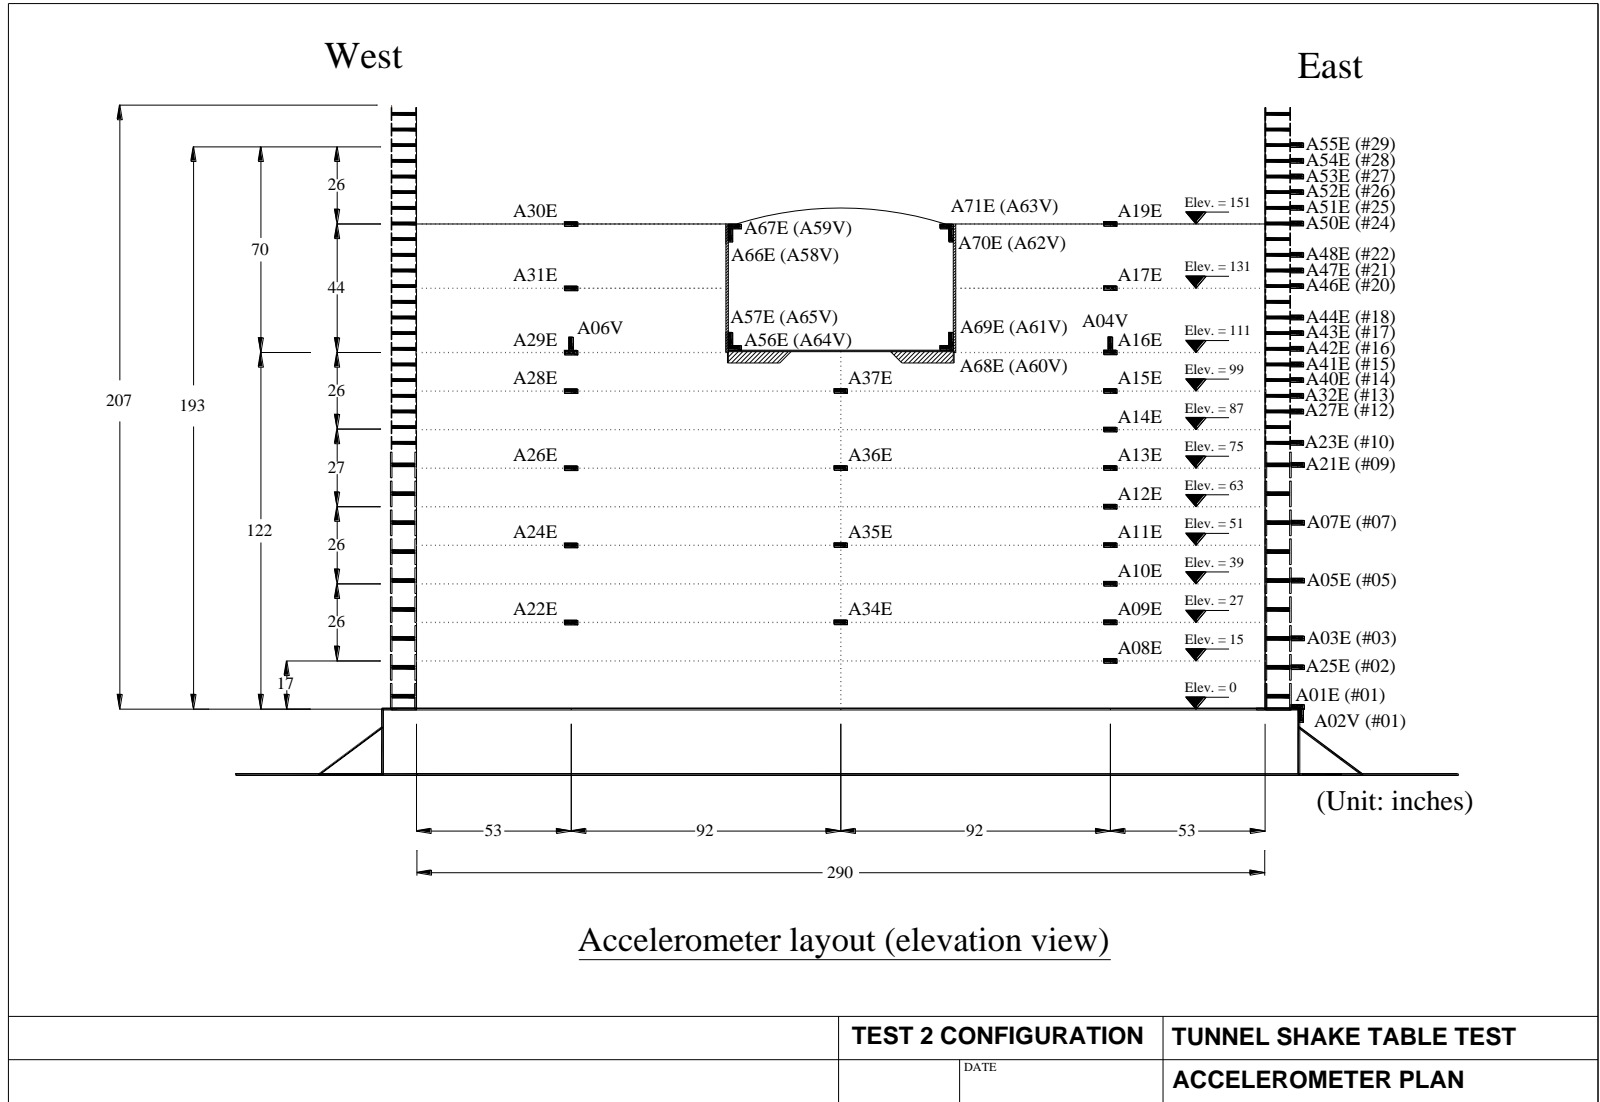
Elevation view of accelerometer (A) layout for Test Model 2
